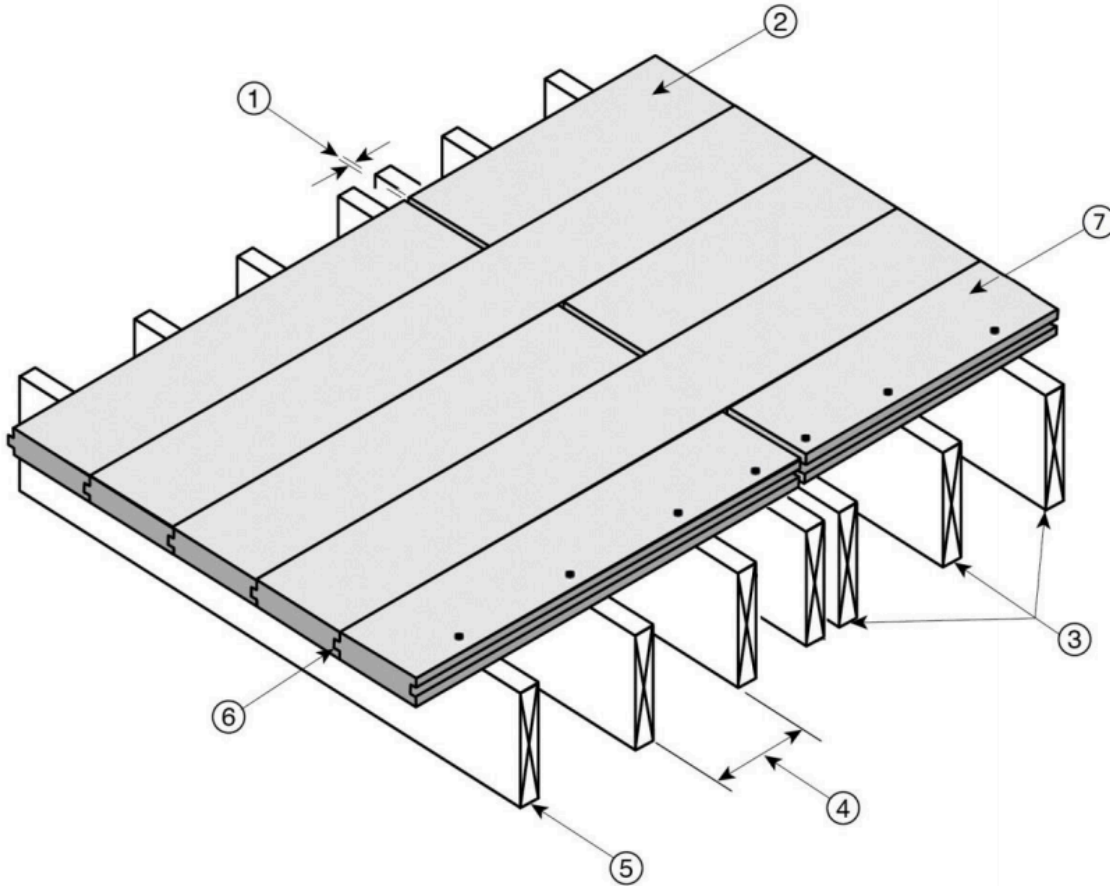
Installation details for Inteplast Porch and Wolf Serenity Porch, interlocking (tongue-and-groove) profile
